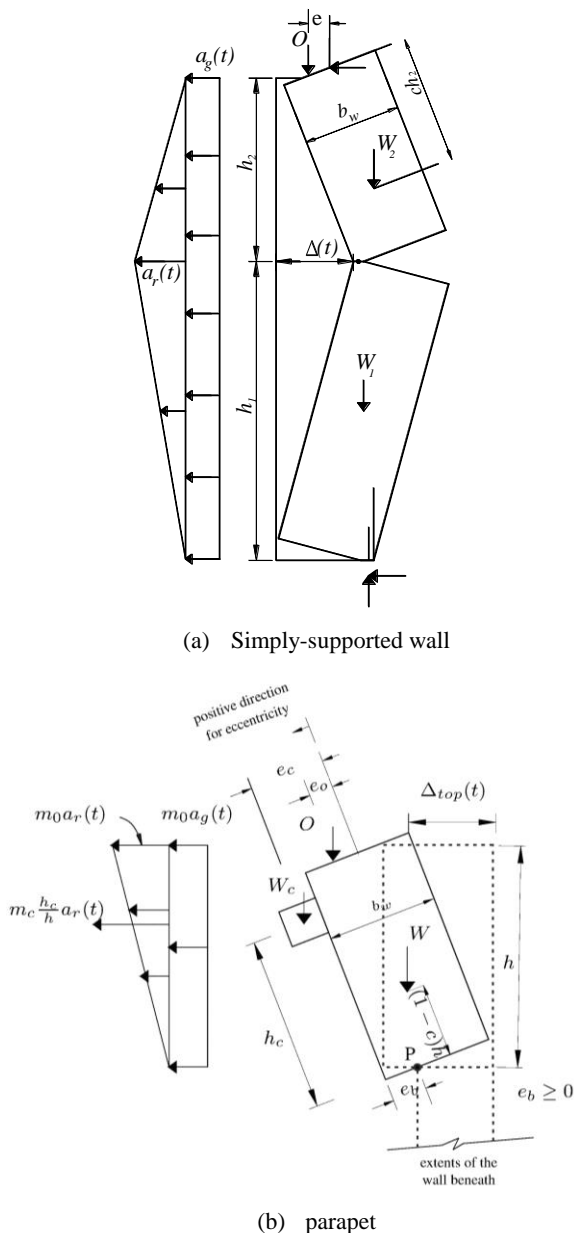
Cracked URM wall or parapet subject to out-of-plane lateral acceleration.
